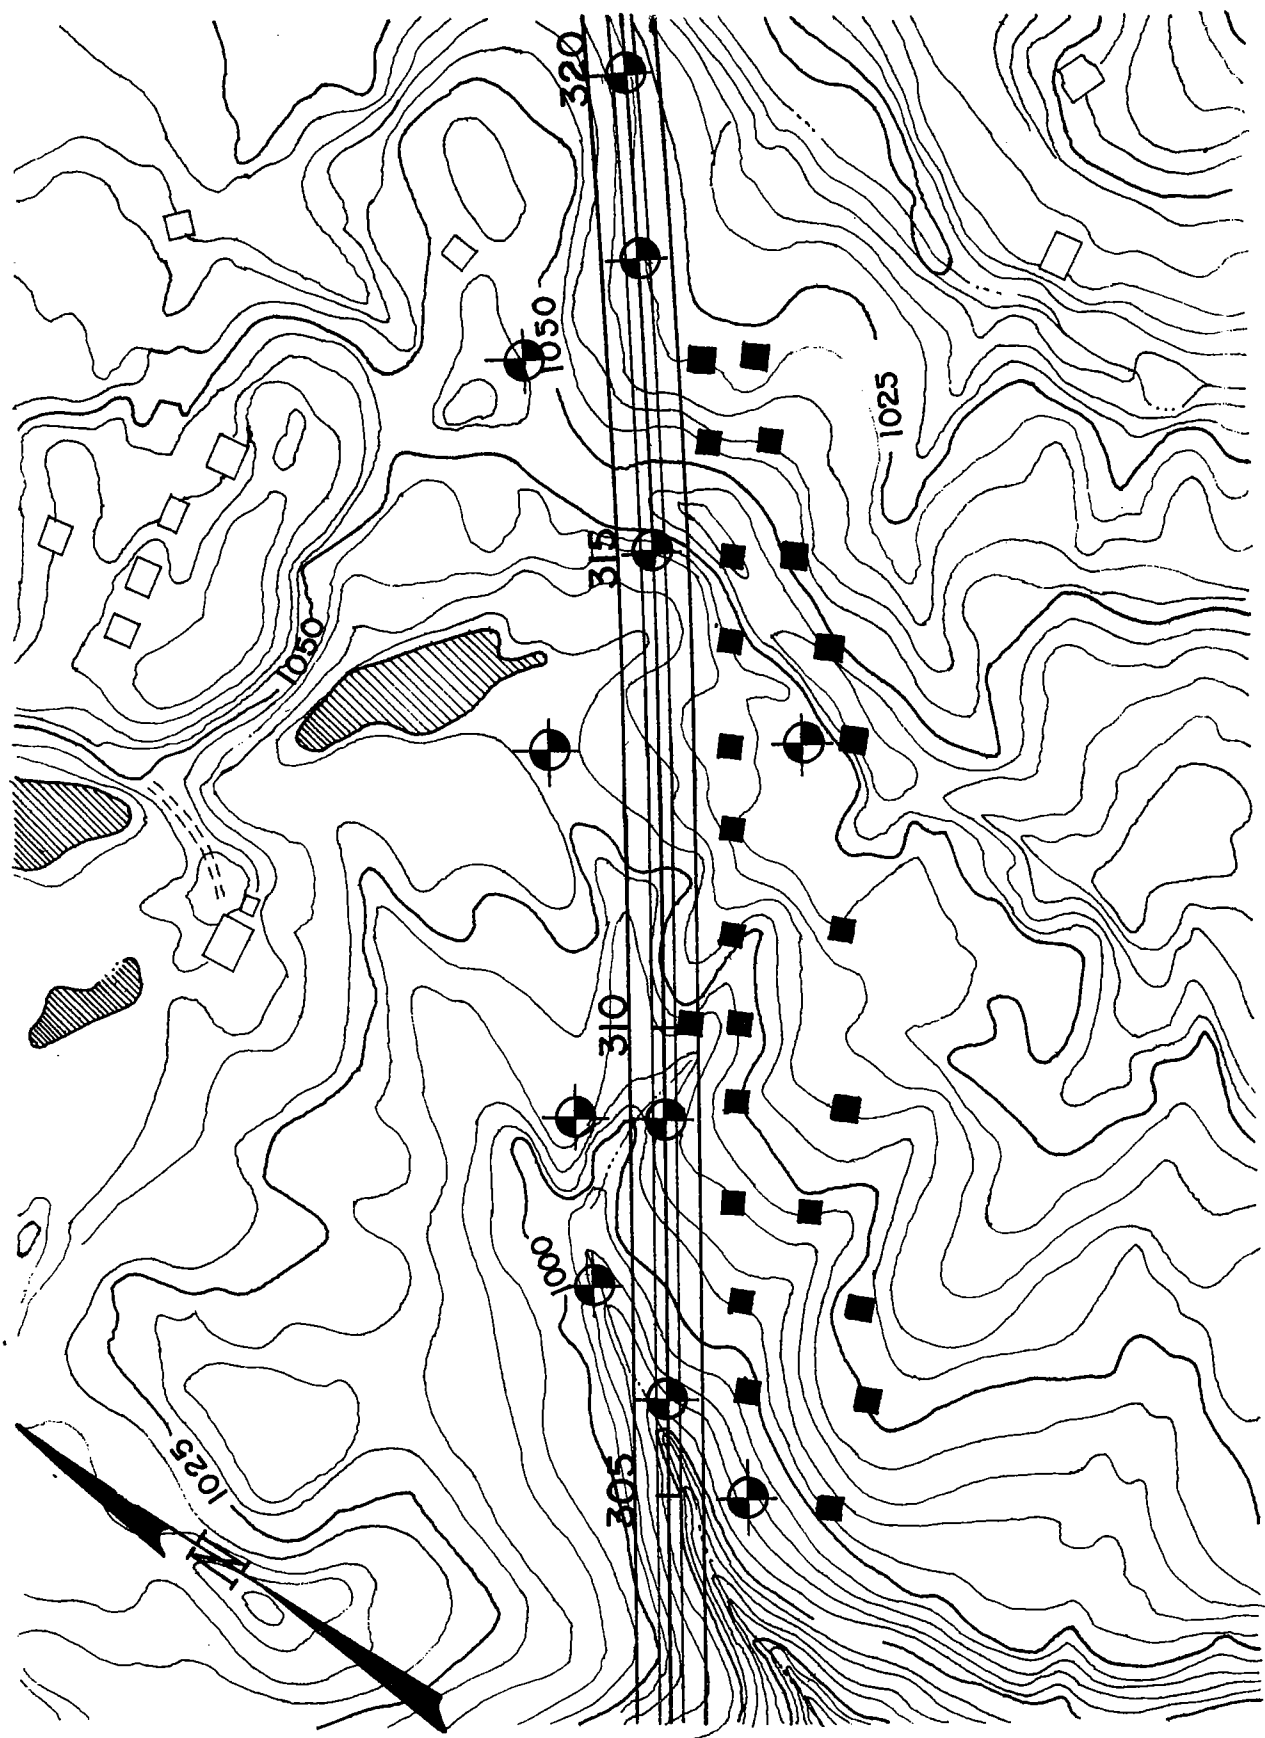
Plan View Showing Core Boring At Stop 5.
